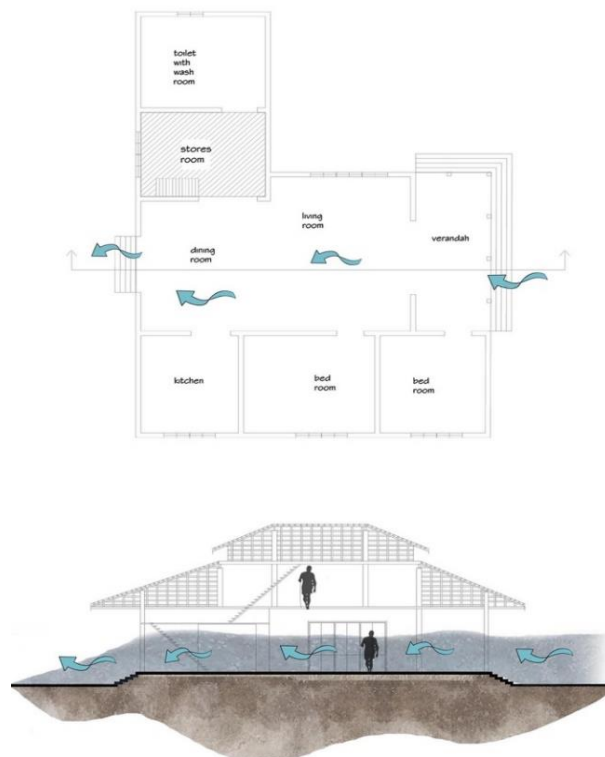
Floor Plan and Cross Section showing movement of flood water and level of inundation in Case 6 (Source: Henarangoda, 2020)
